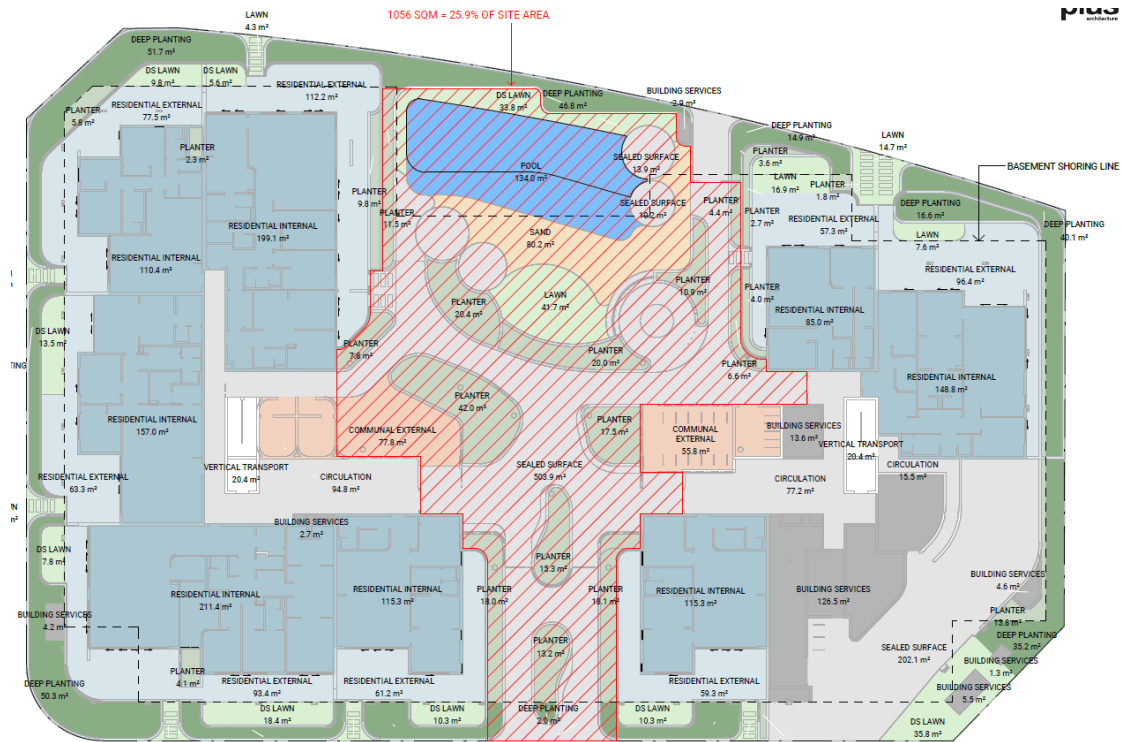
Basement footprint indicated by black dashed line (Source: Drawing No. DA551 DA Plans by plus architecture June 2021)
